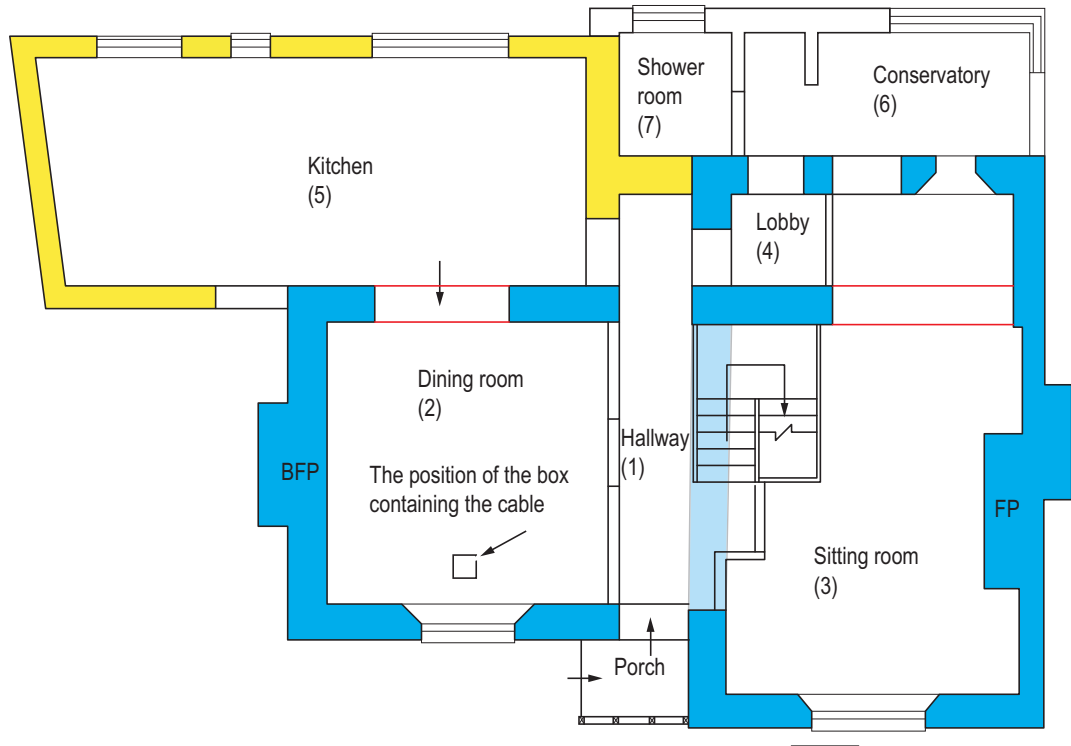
Cable Cottage, Salcombe; ground floor plan.
